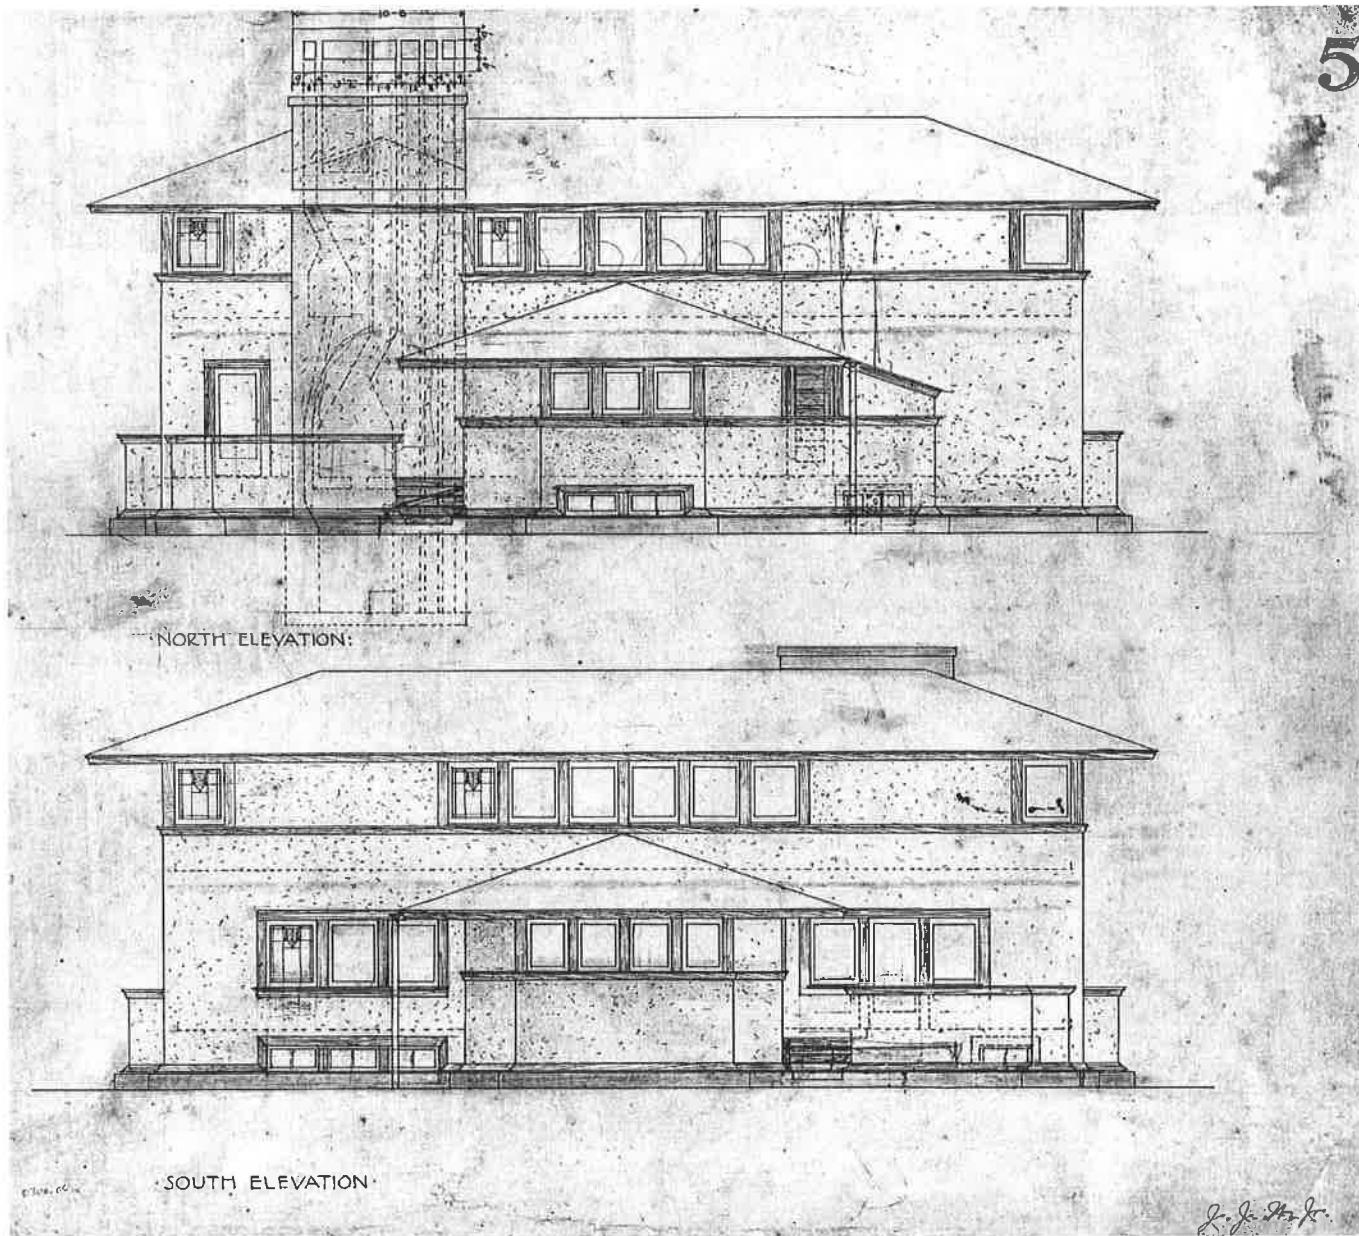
Original Joseph J. Walser House north elevation (top) and south elevation (bottom)
